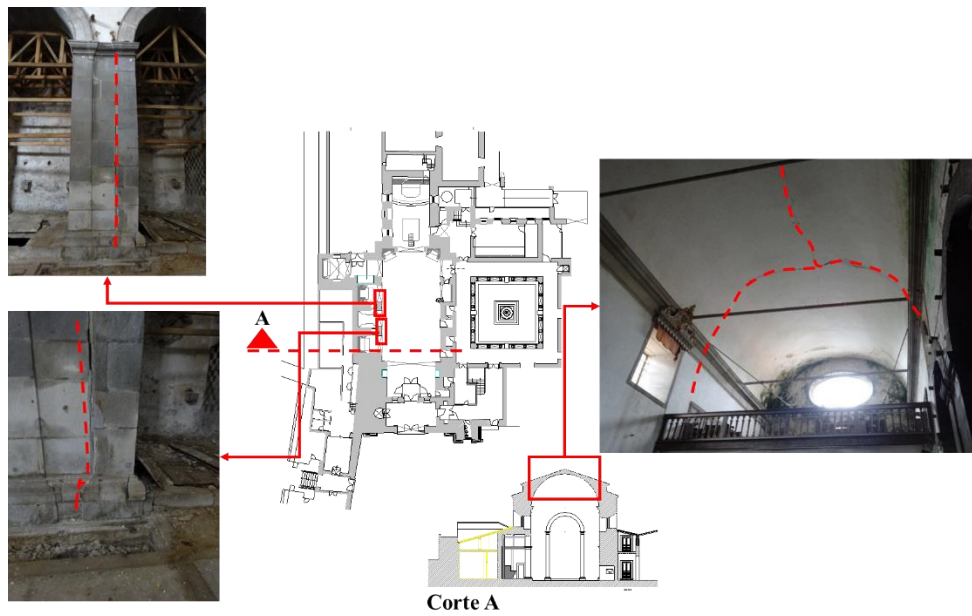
Main cracks observed on Santo António Church during the visual inspections.
